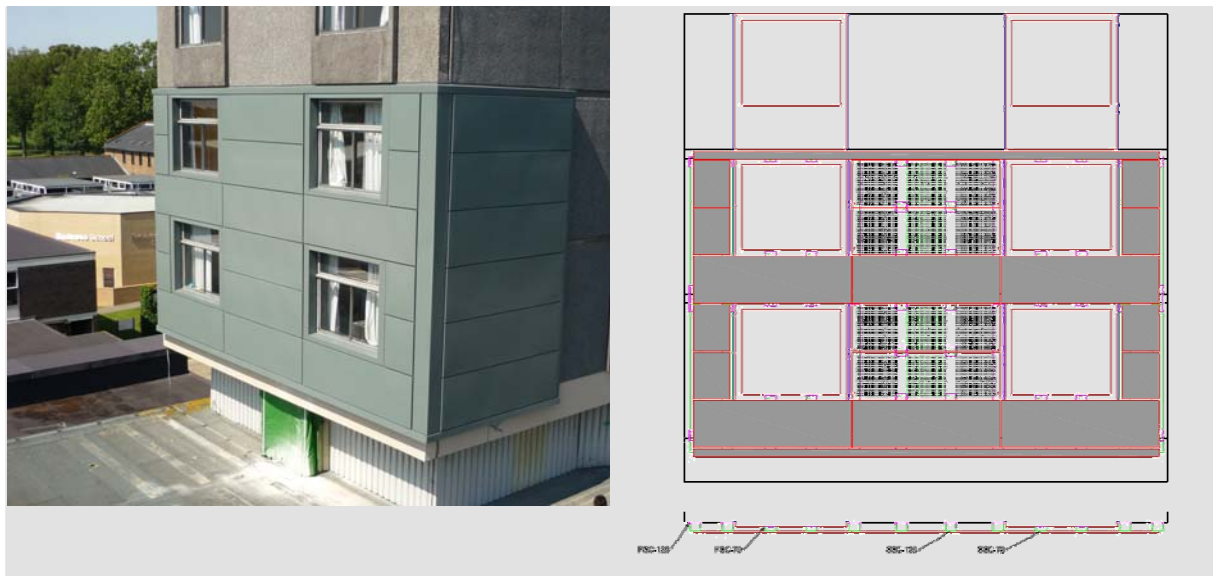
Application of TSC in over-cladding of a concrete panel building (perforated panels shown on the right)
